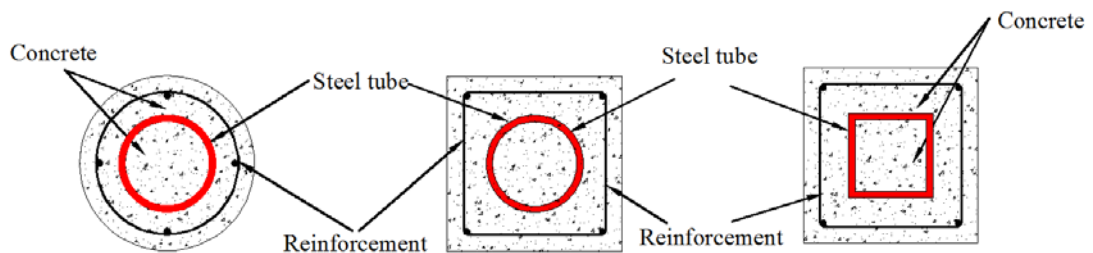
Concrete-encased CFST columns (Han et al. 2014)
